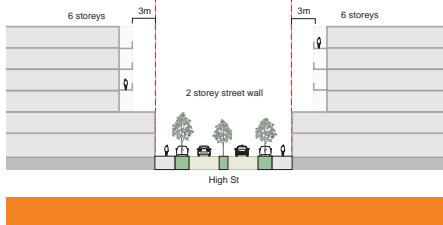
High Street, High Street Precinct. A two-storey street wall height is proposed, consistent with the existing character.
